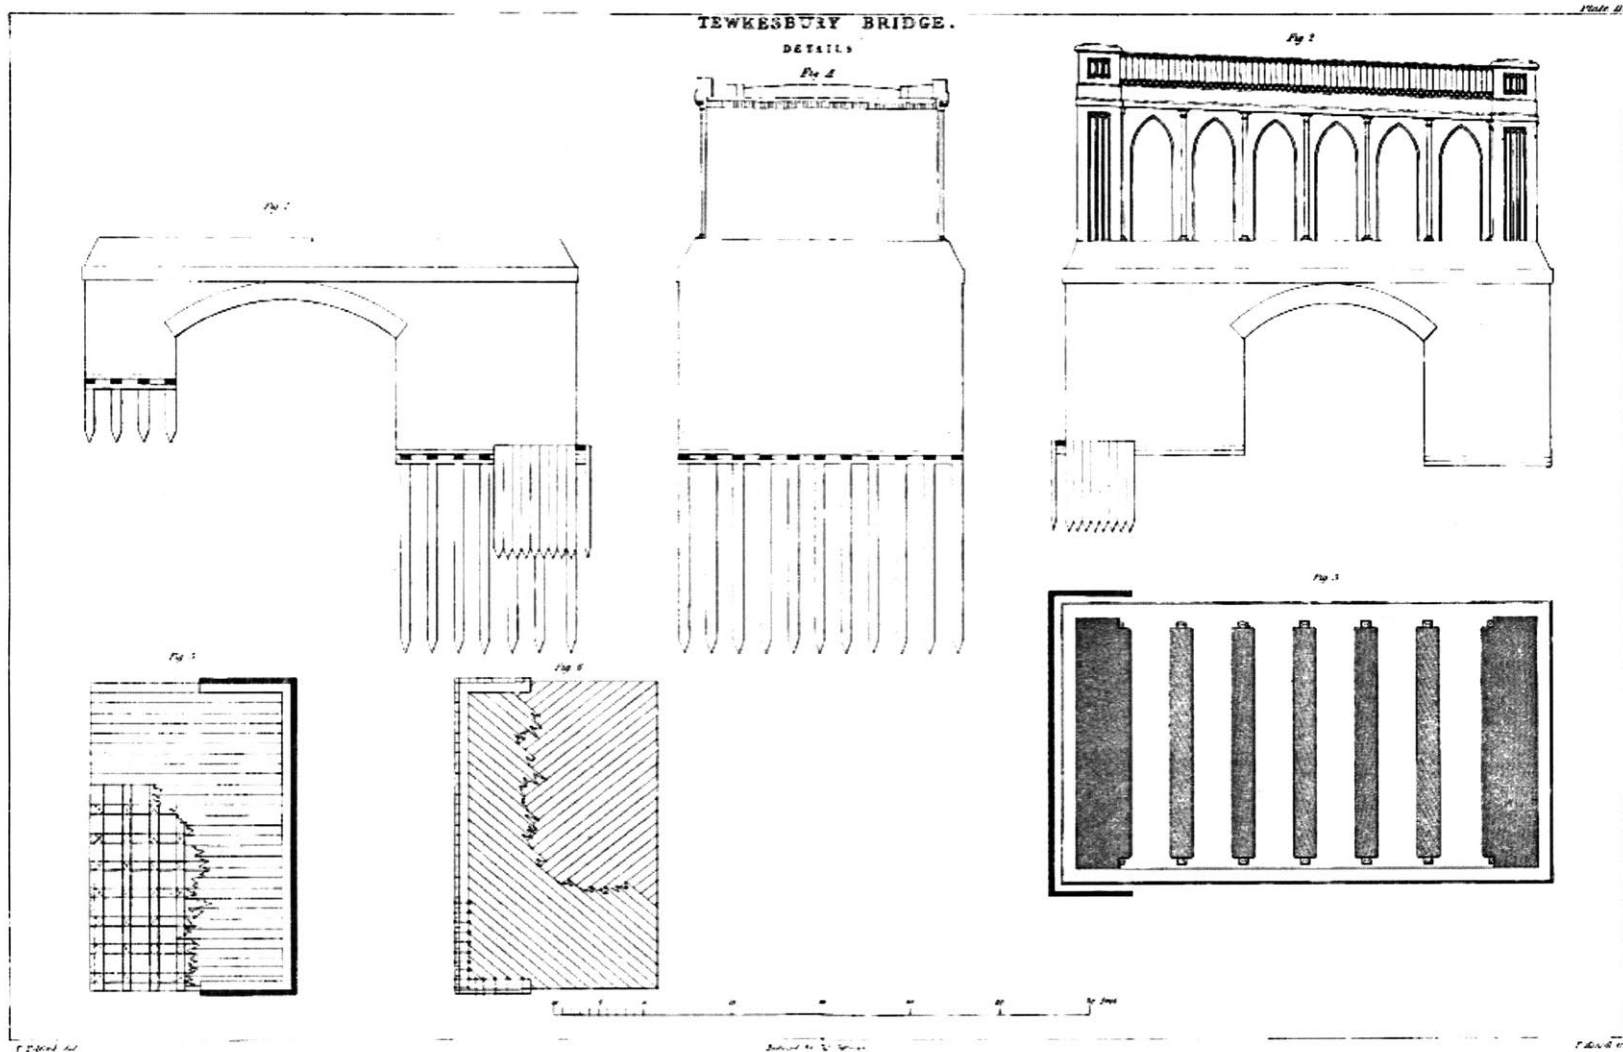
Telford's original drawings of Mythe Bridge – abutment details (Mackenzie)
